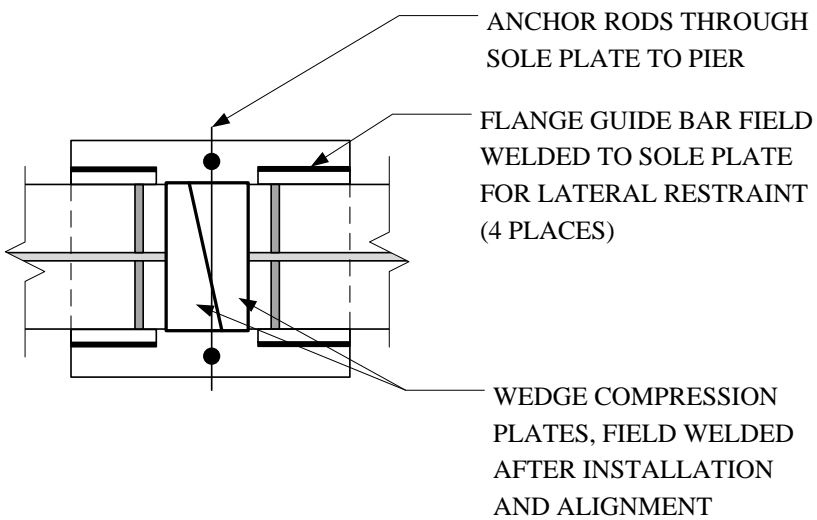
SMC Girder Support Detail 3 - Plan View
